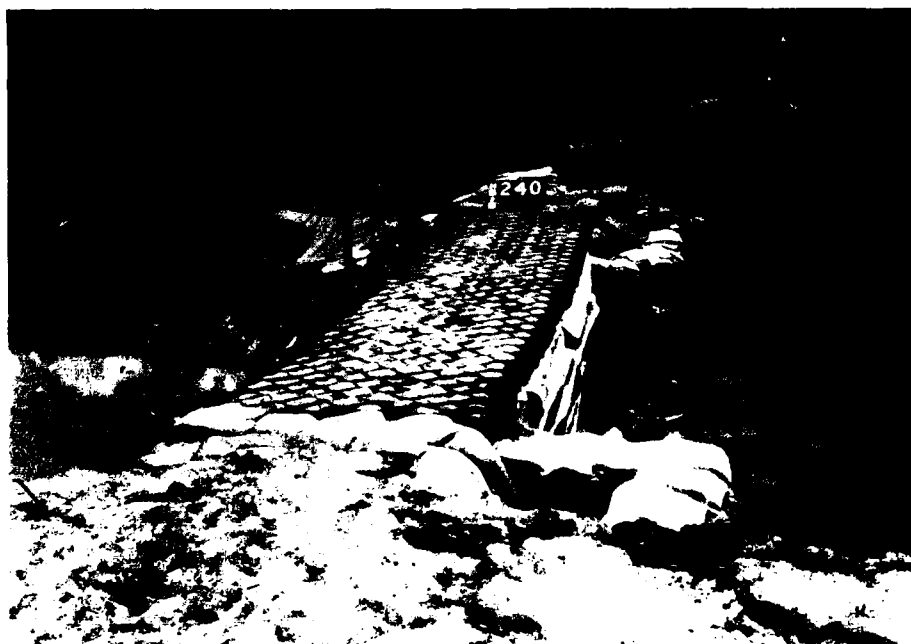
End view of Section 6-1 after 18 hr of wave action at the 3.0-ft water level
